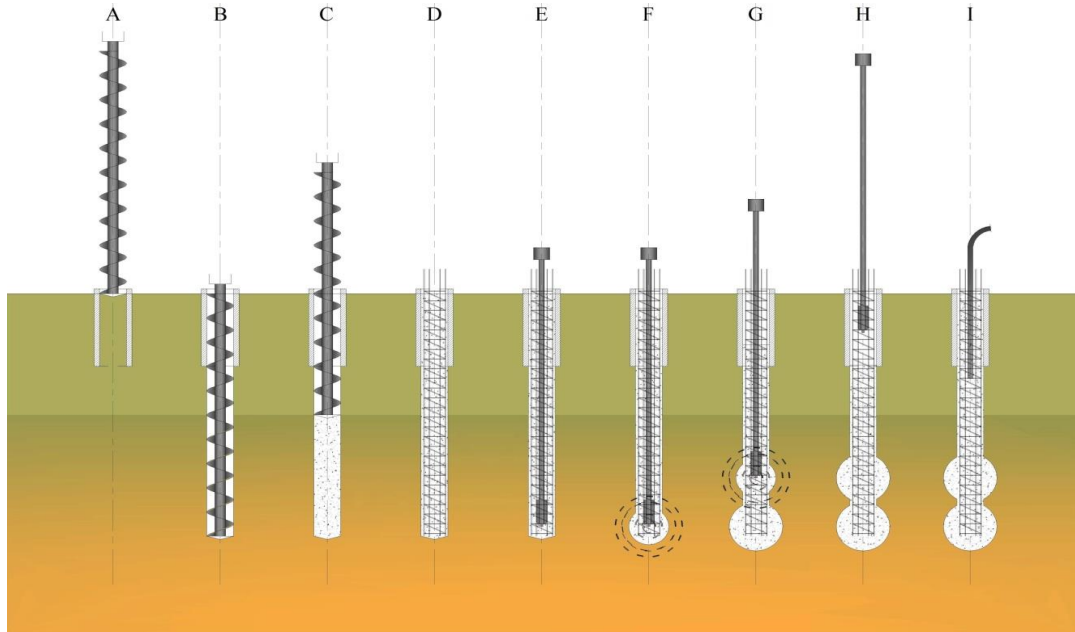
Installation of pile with PDT treatment of bentonite drilling mud
